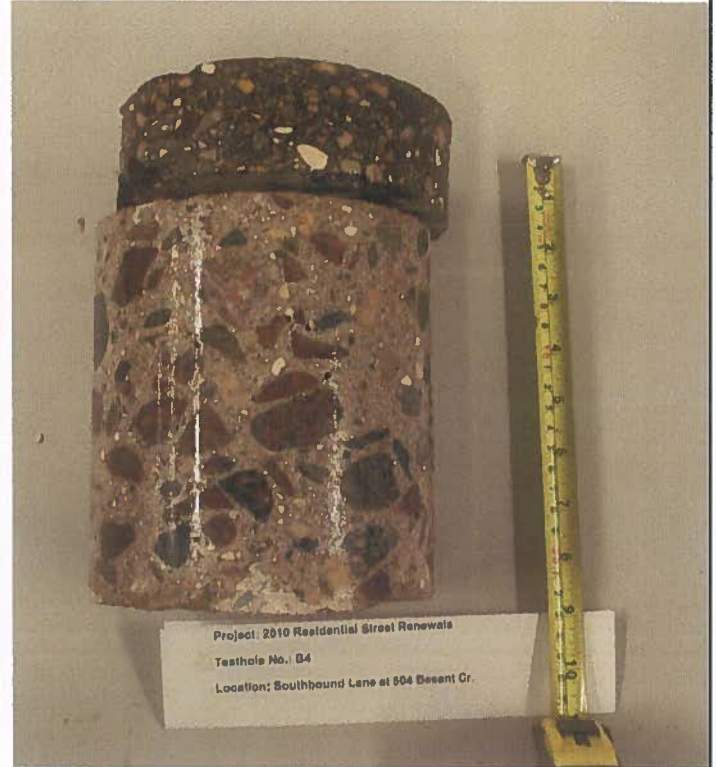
Test Hole B4: 504 Besant Cres. Southbound Lane, 165m S of S Munroe sidewalk, 1.9m E of W curb
